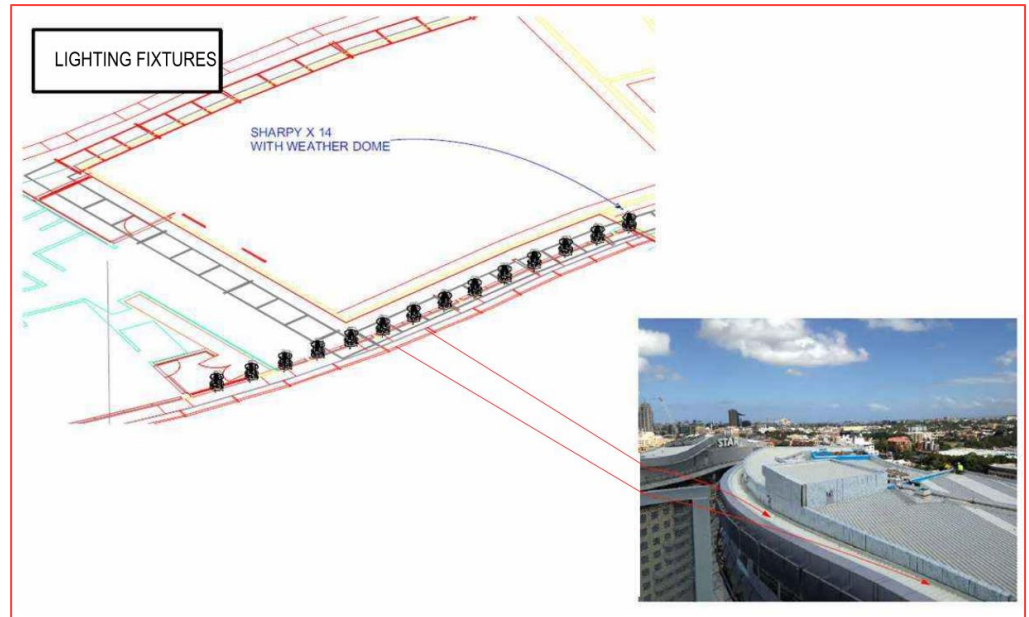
SLE Astral Hotel Rooftop Lighting Layout
